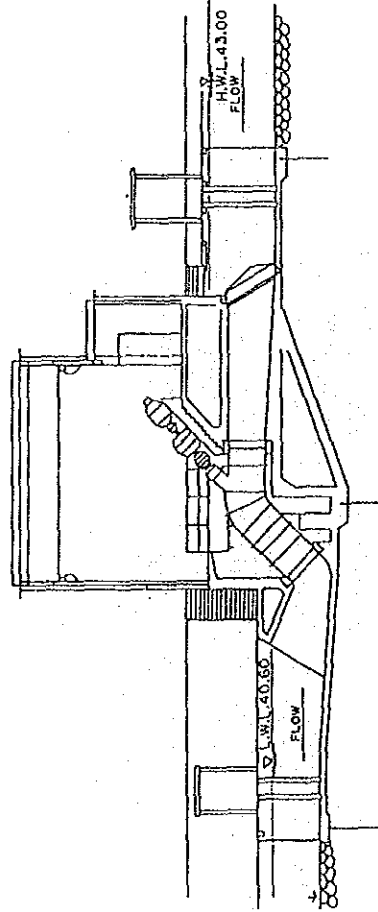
Proposed Plan of El Badraman Drainage Pump Station
